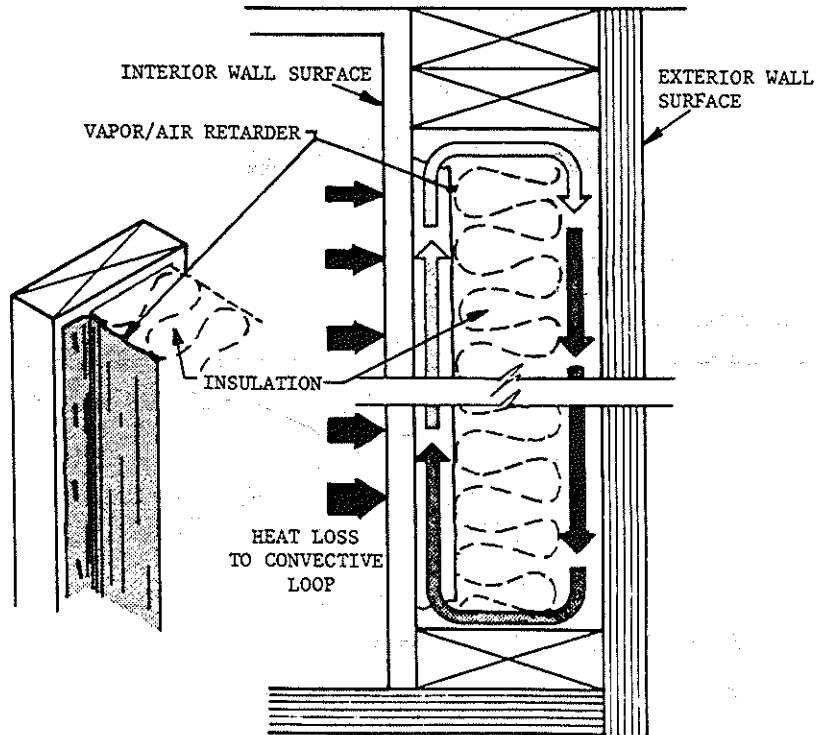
Closed convective loop, example of improperly insulated exterior wall
